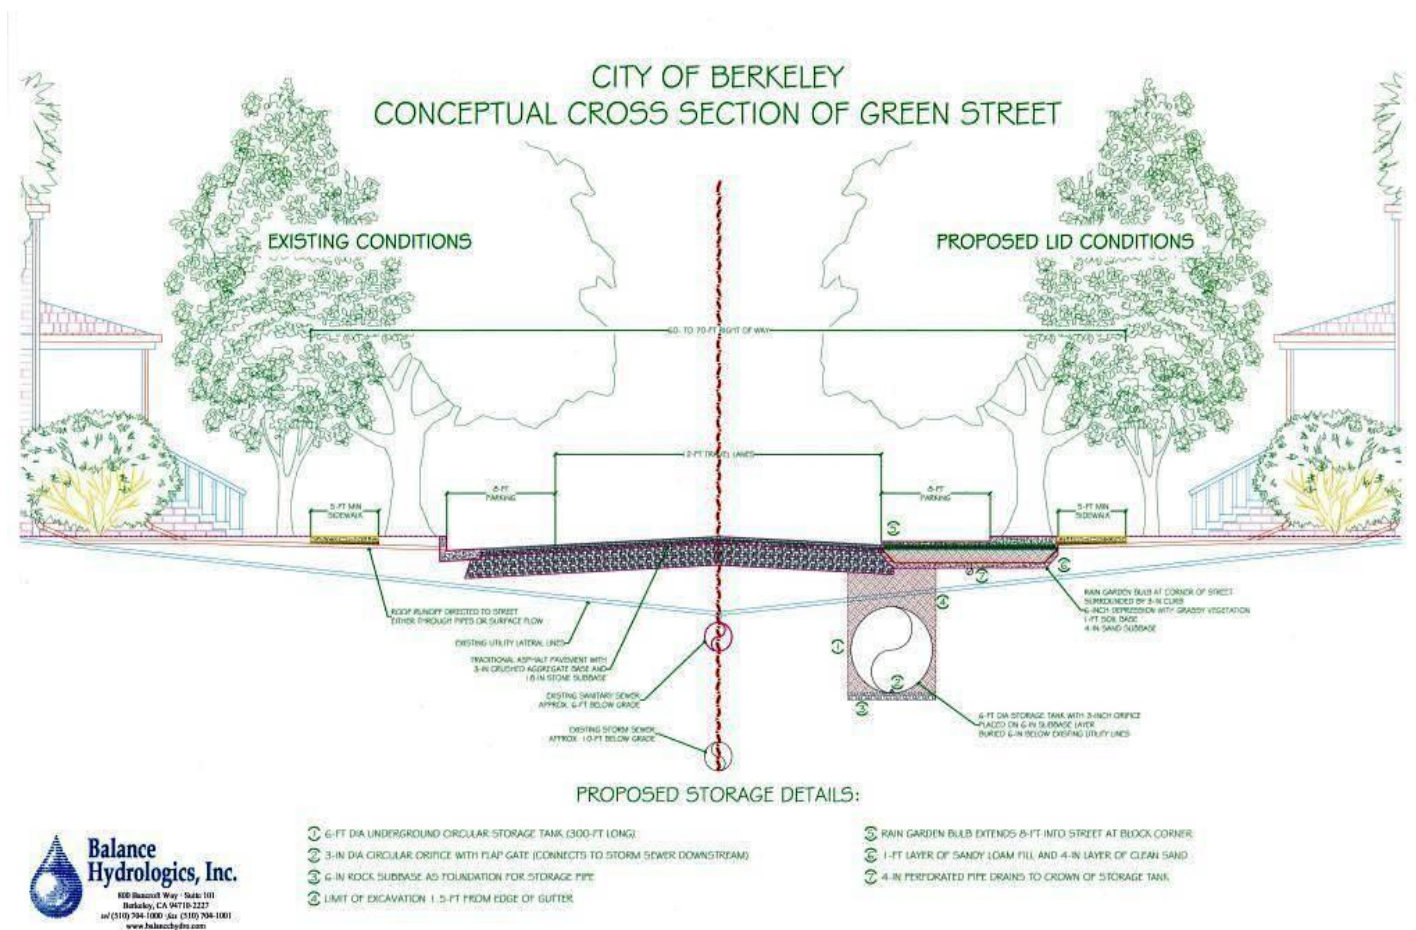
, Conceptual Cross Section of Typical Green Infrastructure
